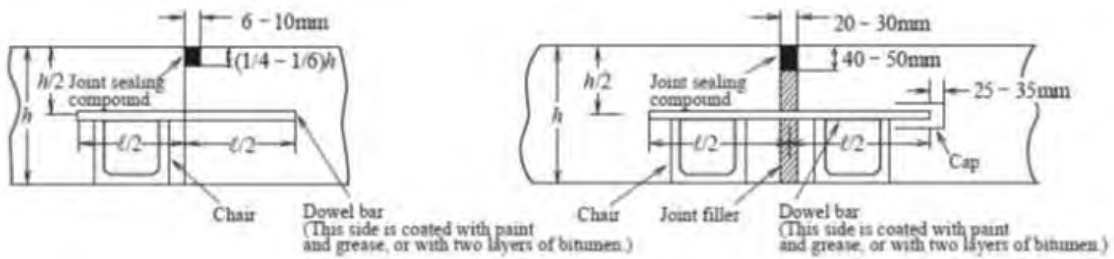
Transverse Construction Joint      Figure 3-15 Transverse Expansion Joint
